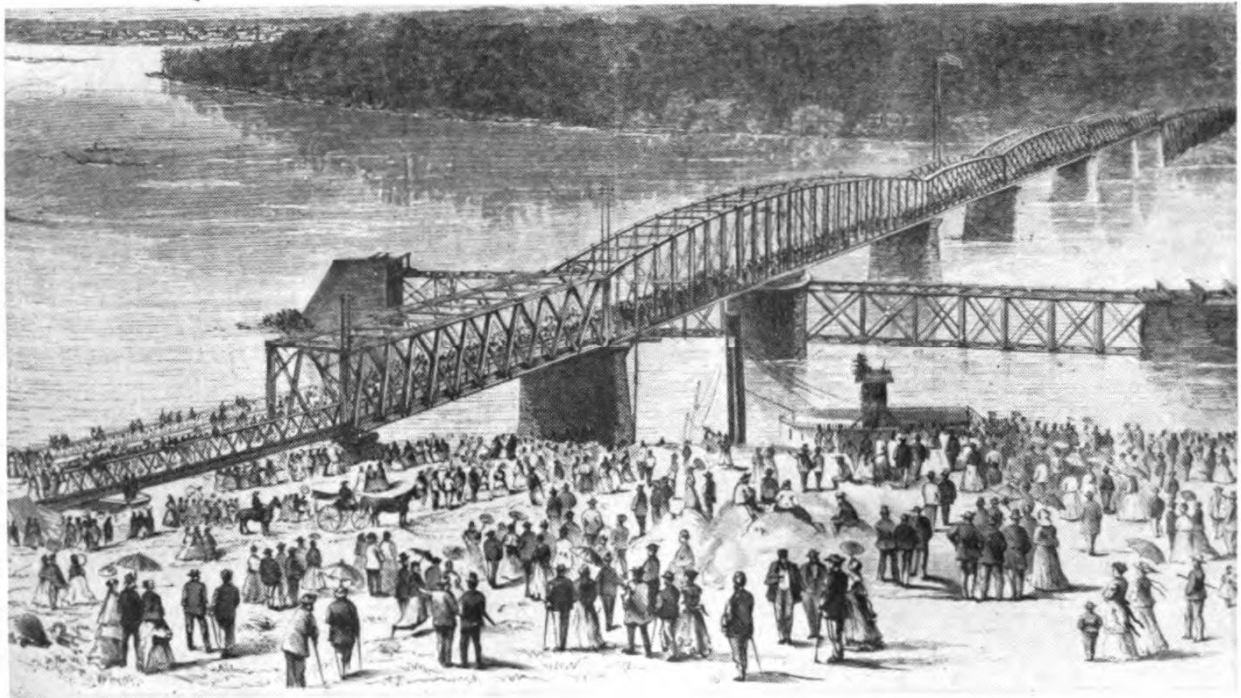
Early Missouri River Rail Bridge in Kansas City (Source: kcmeesa.com)
